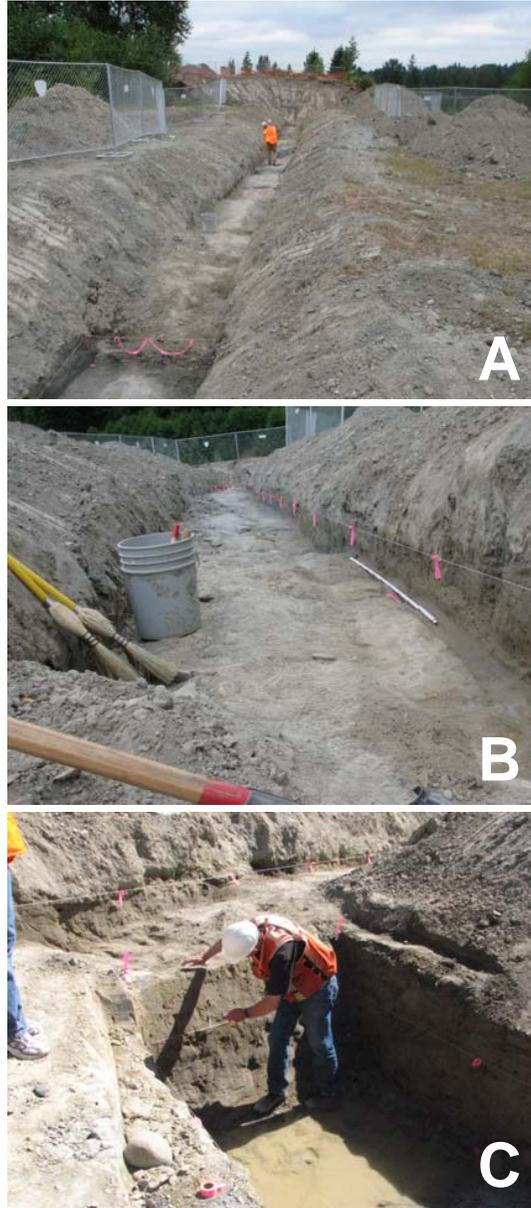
Photographs of North Trench. A. View looking southwest along trench showing sloped walls above with small vertical walls below; steep slope at southwest end of trench is visible in distance. B. View looking northeast along trench. C. View looking south at pit excavated adjacent to North Trench.
